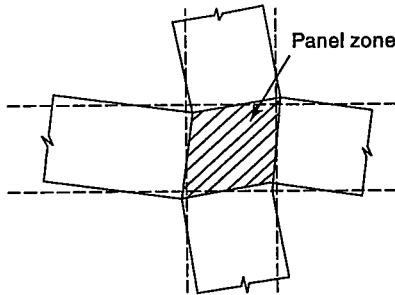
Idealized shear deformation of beam-column panel zones
